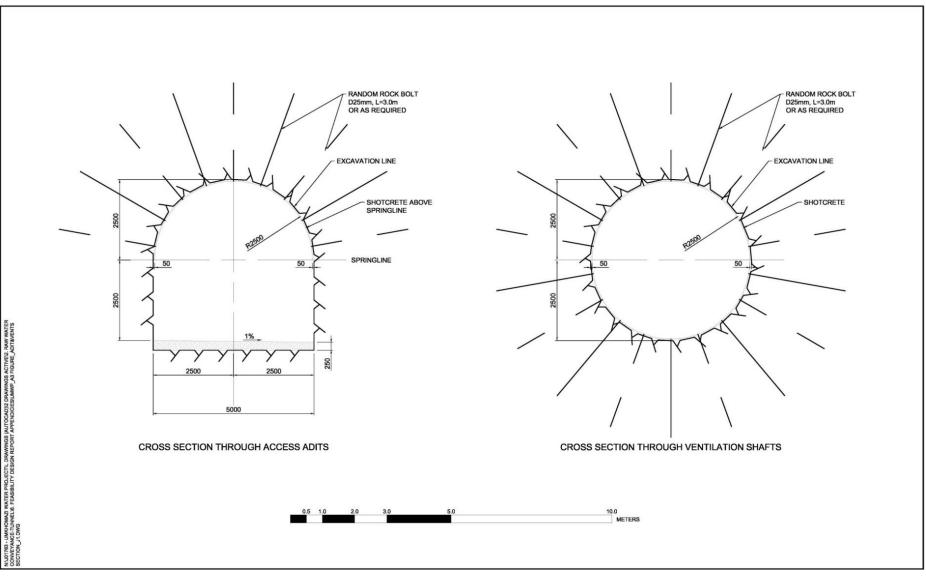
Cross sectional view through an access adit and a ventilation shaft
